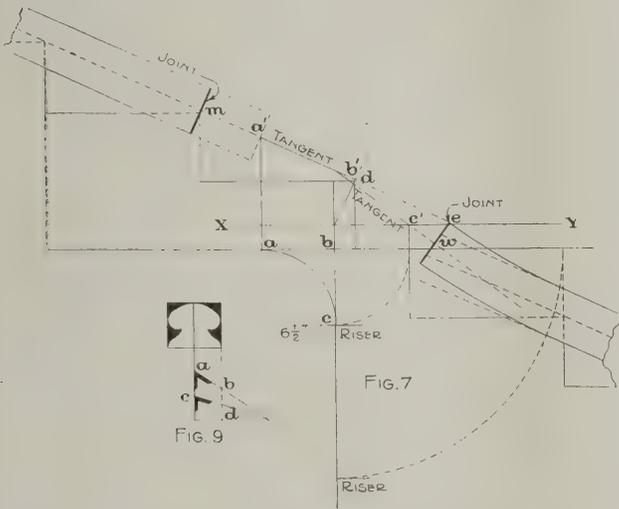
Elevation and Pitch of Tangents Over the Plan, Fig. 6
